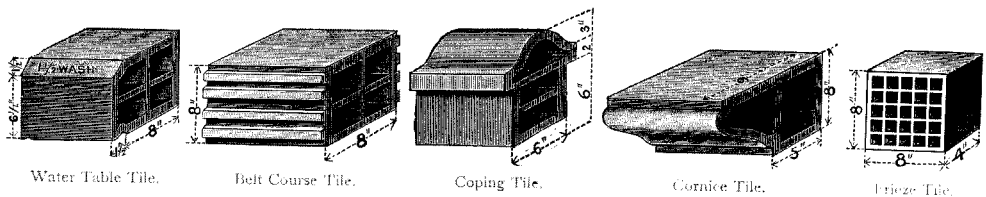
Various styles of structural hollow tile wall units available in the late nineteenth century (from Pioneer Fire-Proof Construction Co., *Hollow, Solid and Porous Tile for Fire-Proofing Buildings*, 38).
